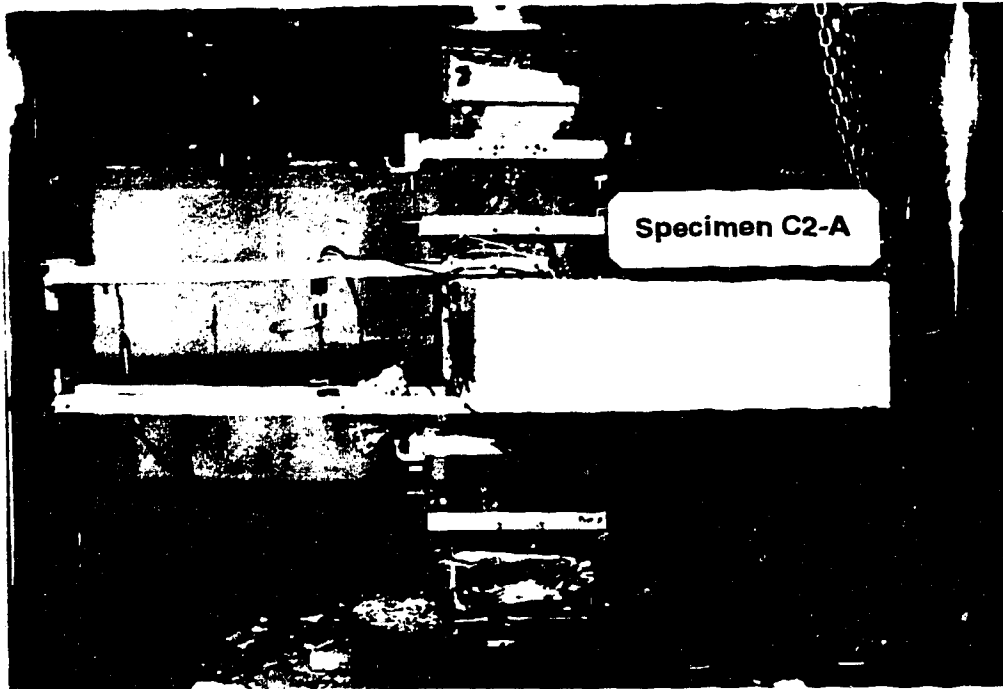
Testing of Edge Sandwich Plate without Slab Loads
